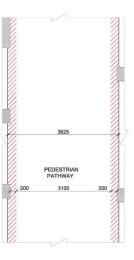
Street width and buffer spaces (in mm) for Gateway 1 in the area surrounding Luisenplatz in Darmstadt
